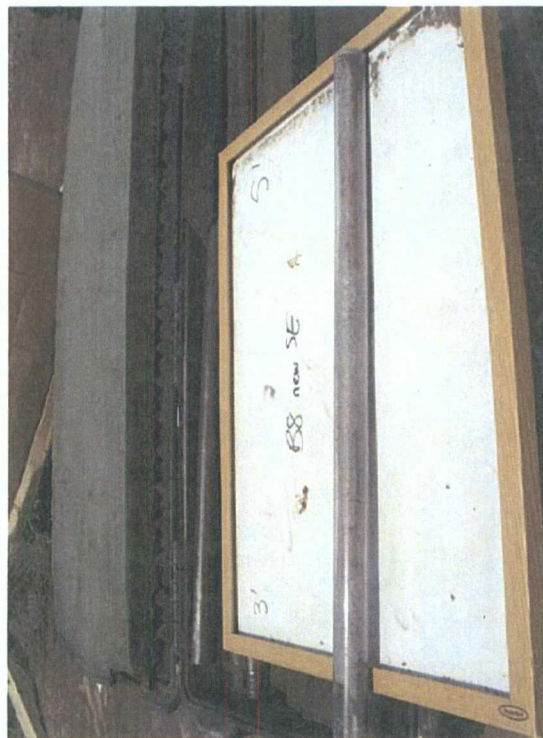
B8 new SE 5' - Sample on whiteboard: first half
